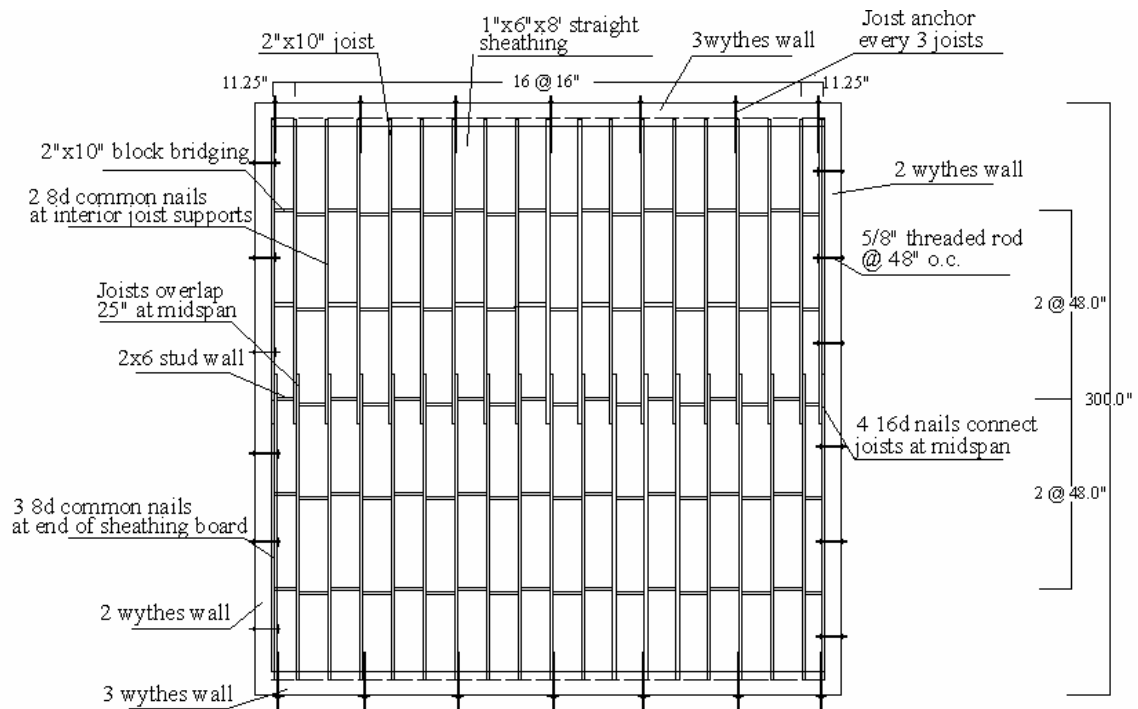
Schematic of diaphragm framing employed in the test structure
